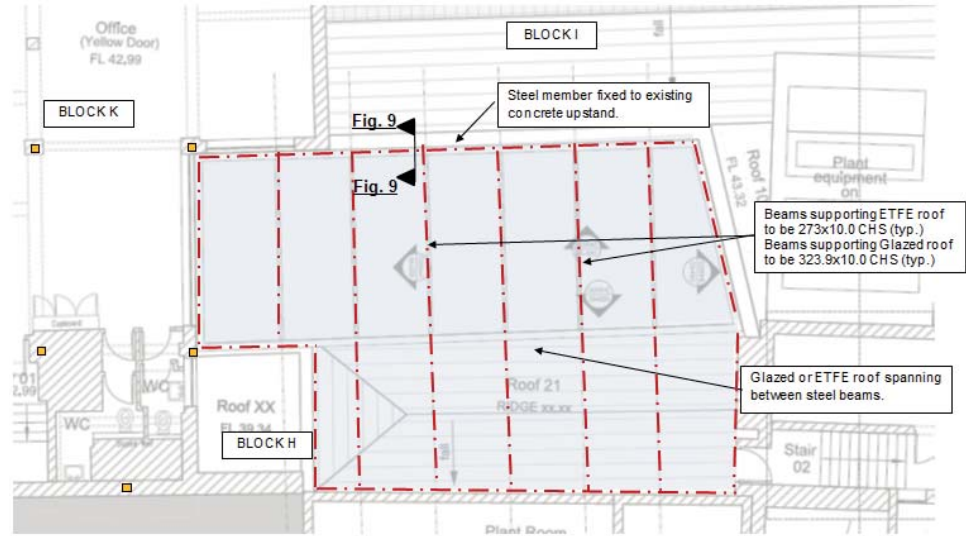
Extract of Sketch SK 006. Roof to internal courtyard – Option 1.
